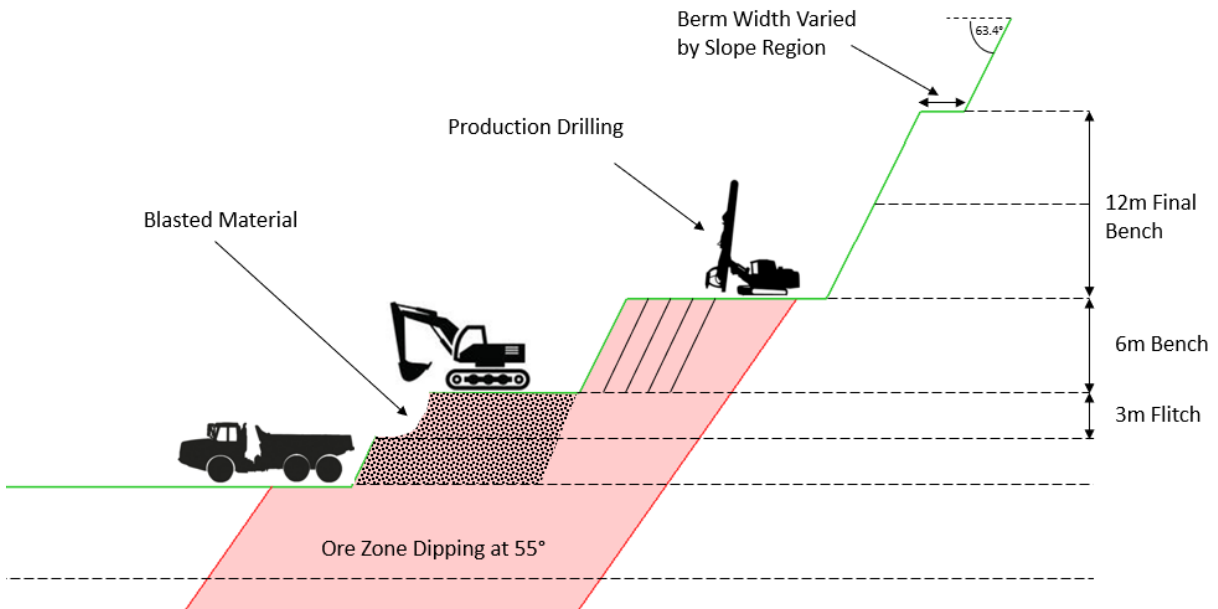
Cross Section of a Typical Bench Layout (Oxides)
